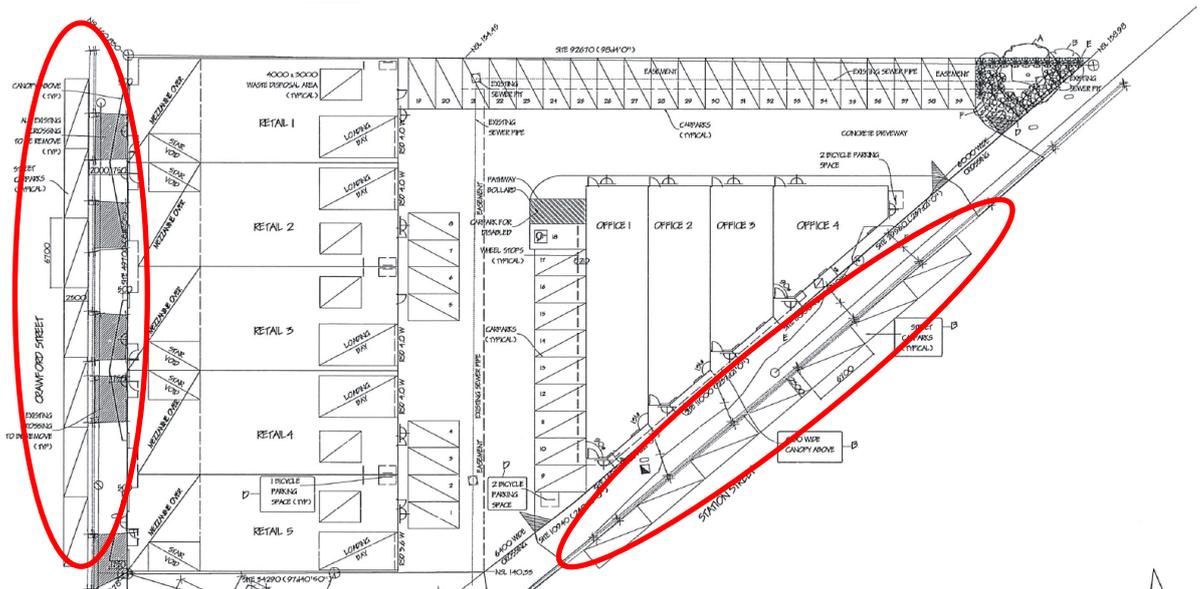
Excerpt from the development plan - on-street parking shown in red
